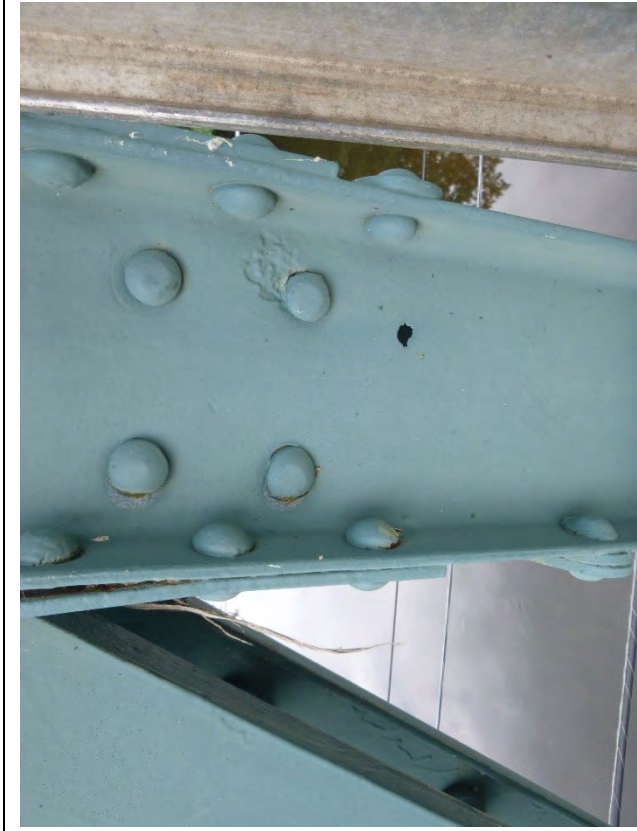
Vertical member in U5 South Truss. Note the rust hole.
